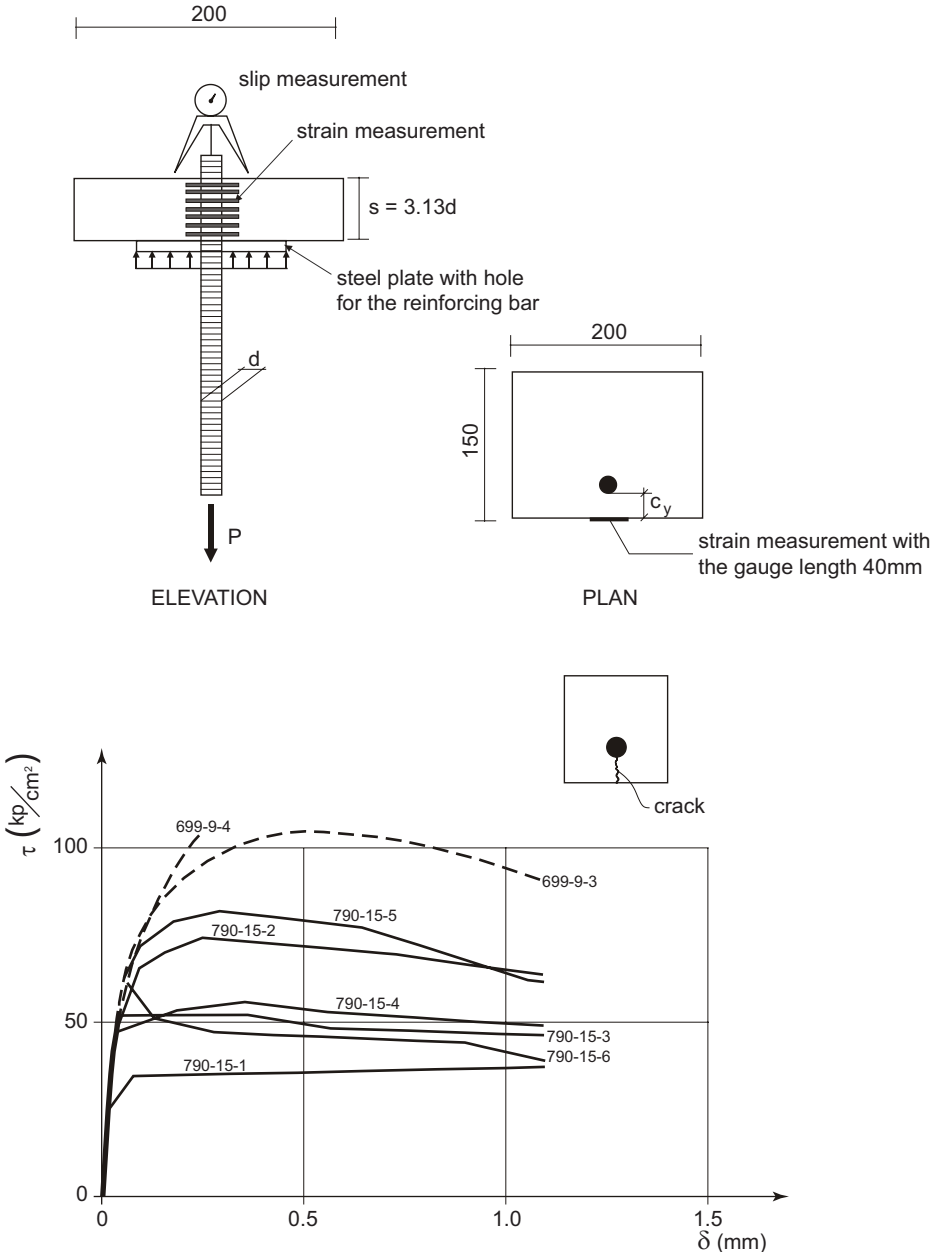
Bond stress-free bar end slip for pullout specimens with eccentric bar placement. The bond stress levels for cracking of the concrete cover along the bar are marked in the diagram for the specimens, Tepfers (1993).
